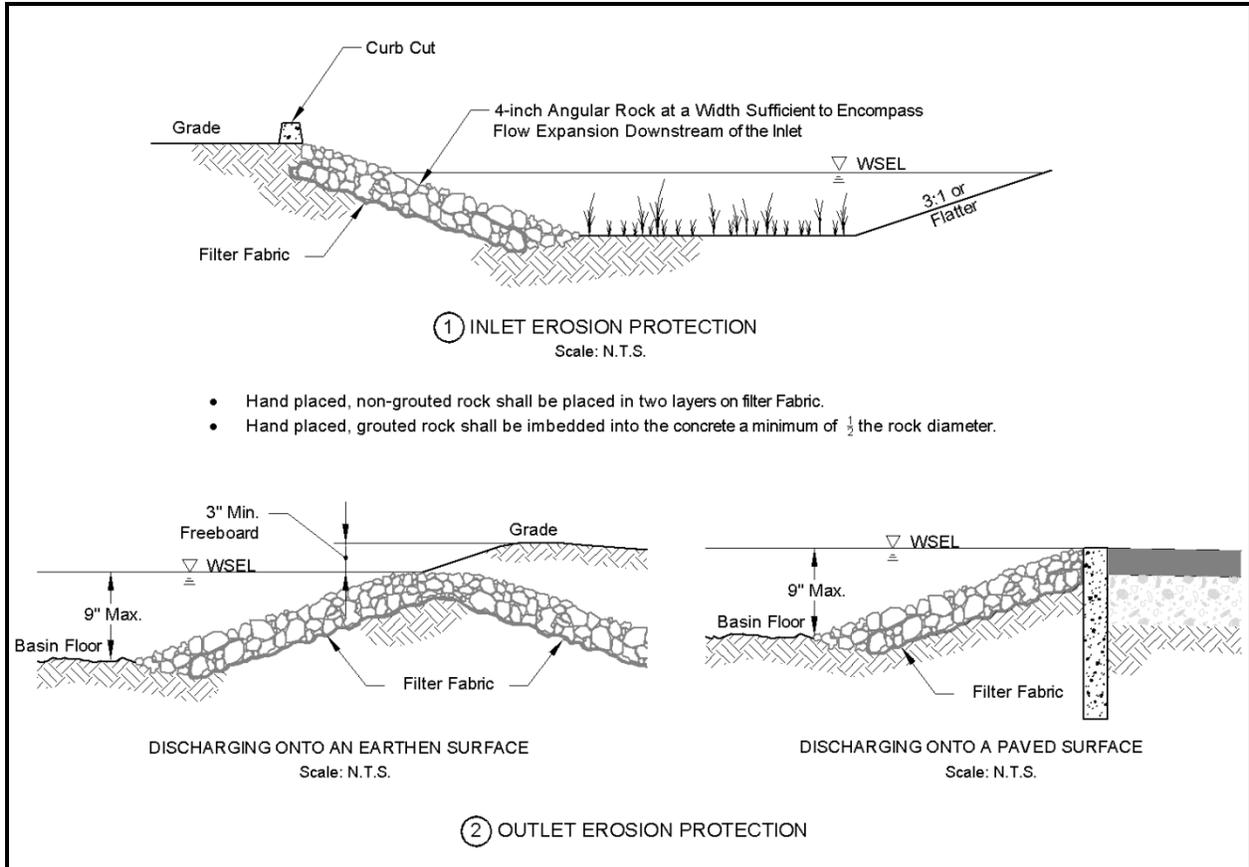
Inlet and Outlet Erosion Protection for Stormwater Harvesting Basins
